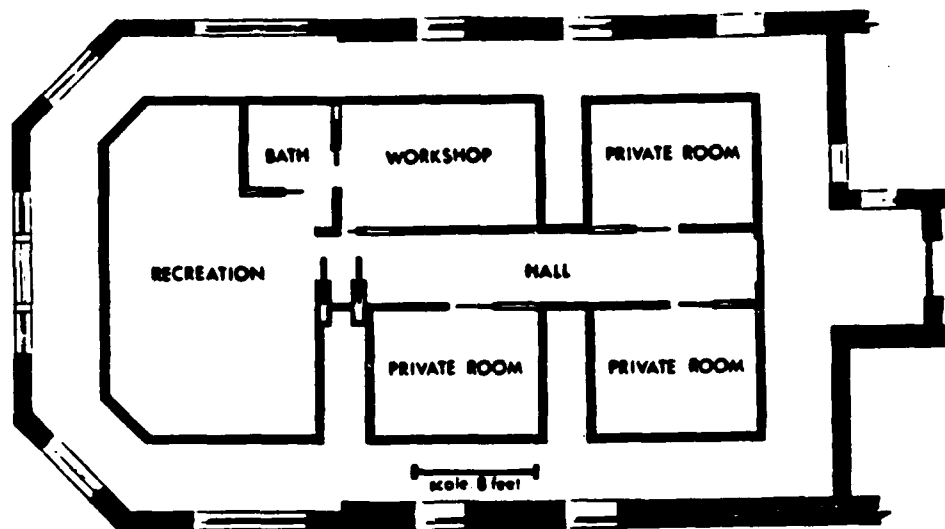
The floor plan of the laboratory and its position within the surrounding building shell.
